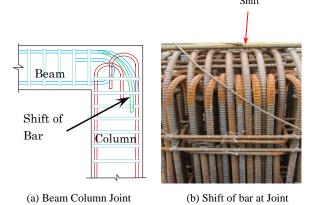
Steel Congestion Problems at Beam Column Joint Area
